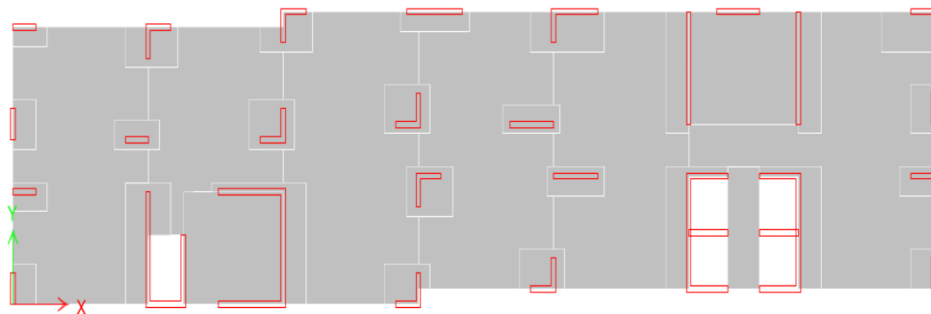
Floor plan of flat and post-tensioned slab system with drop panels on ETABS 2021
